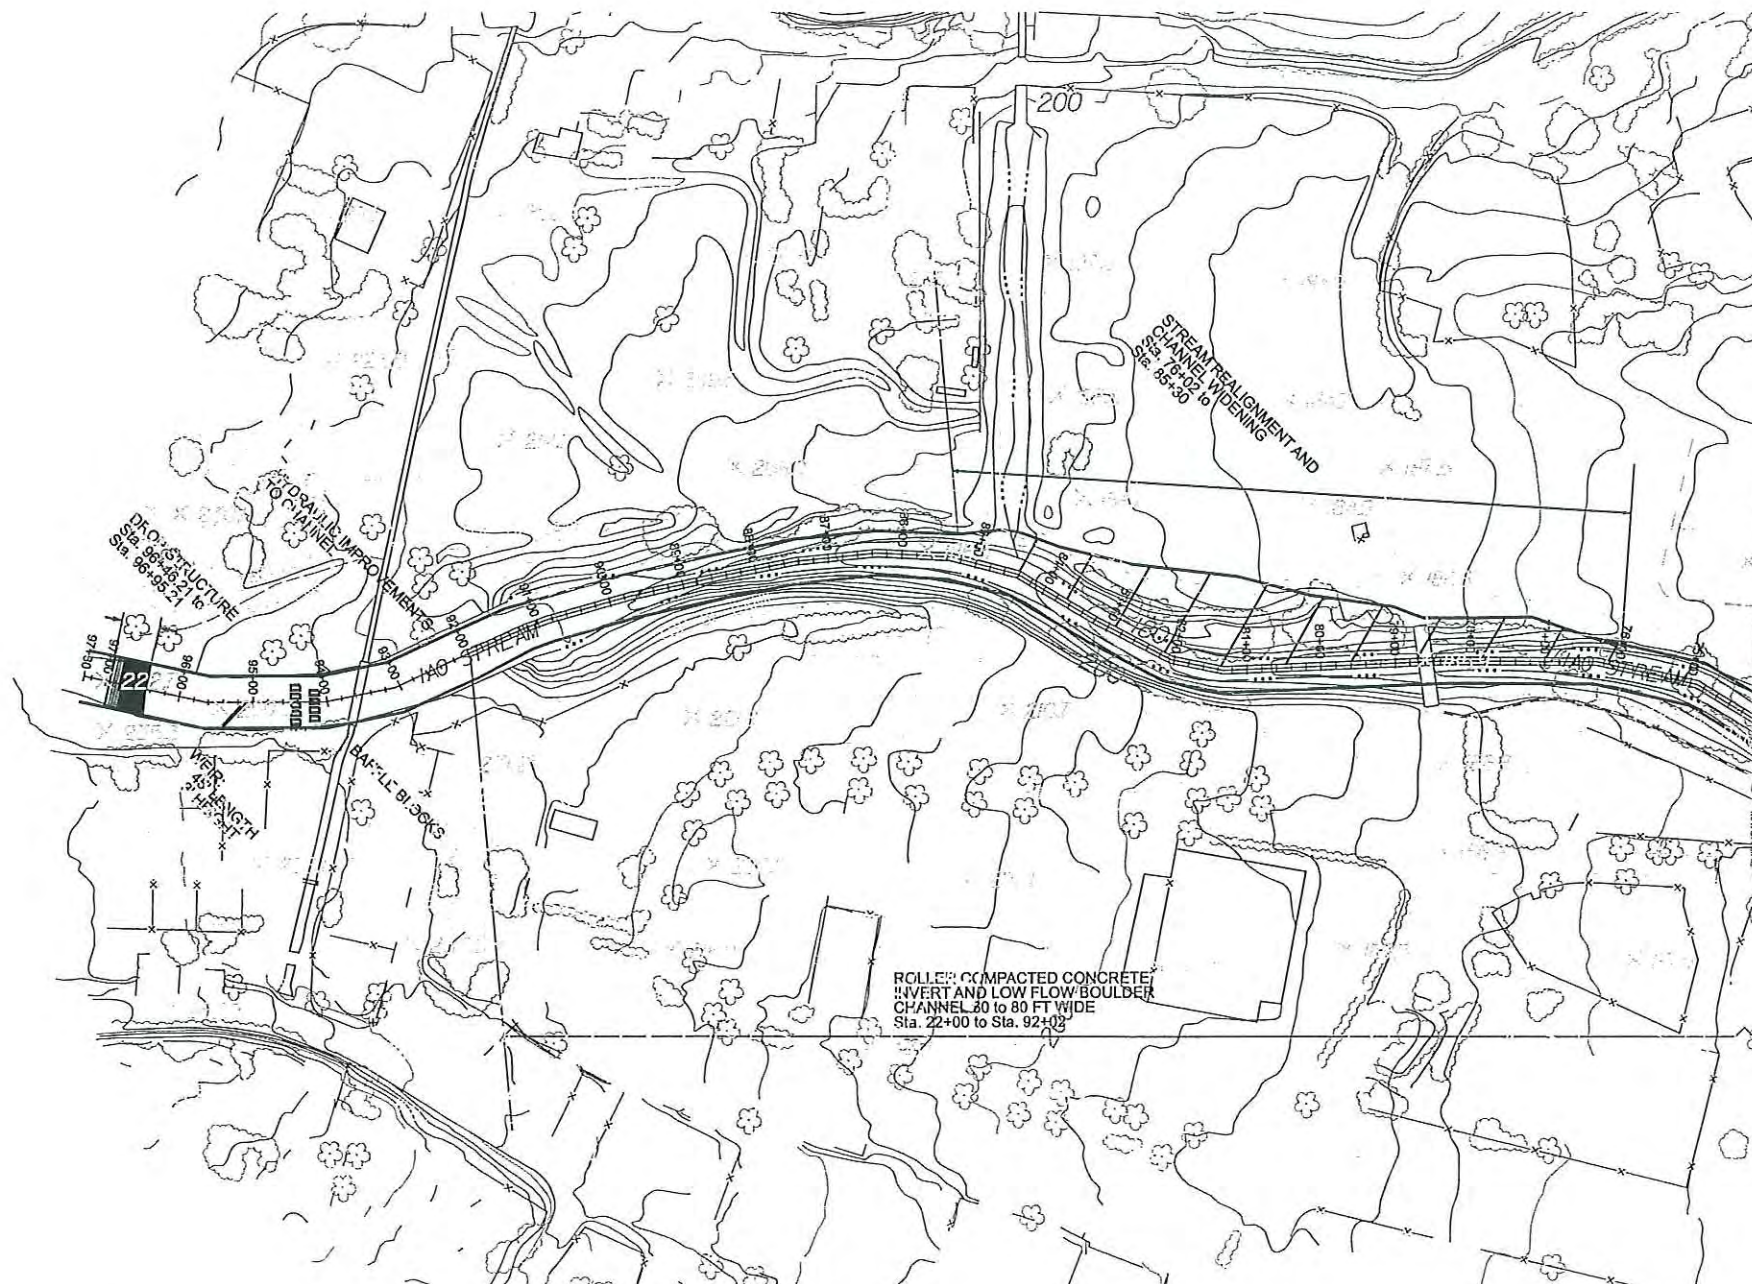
Site Plan for Station 49+00 to Station 74+00.
